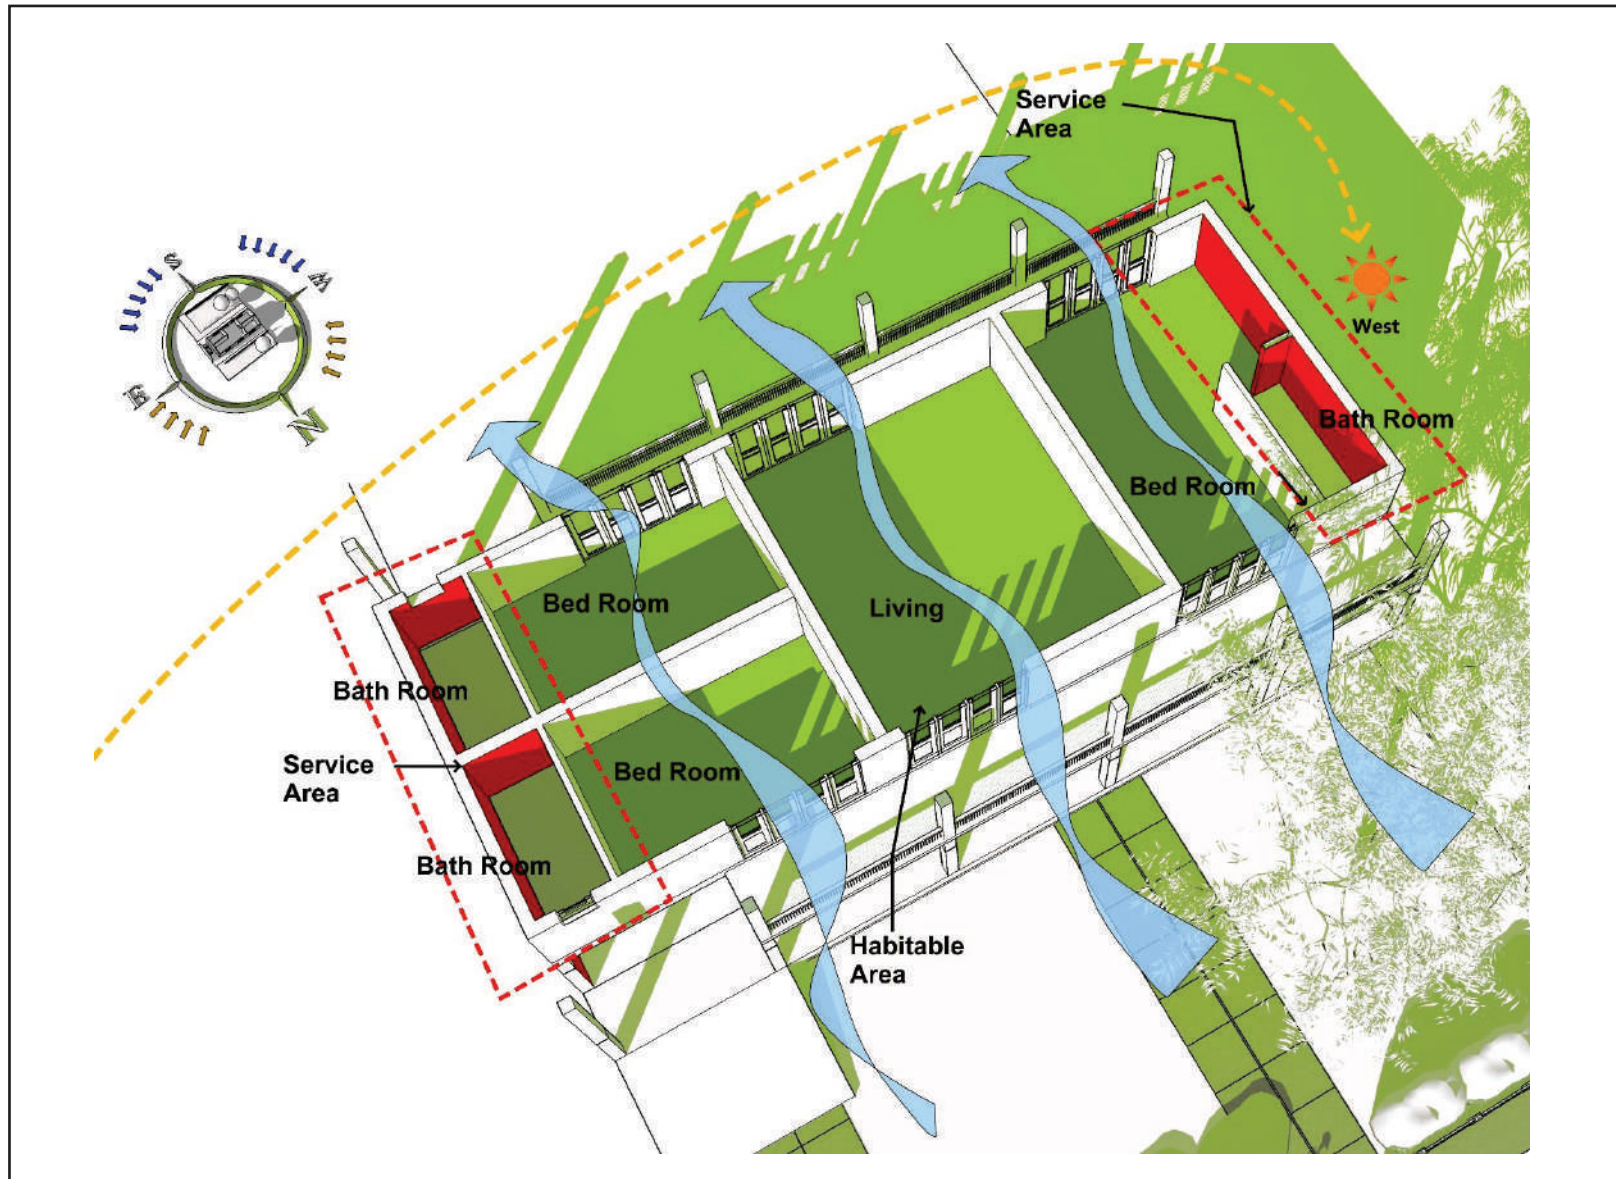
Plan Form - Ground Floor Two Storey Residence
